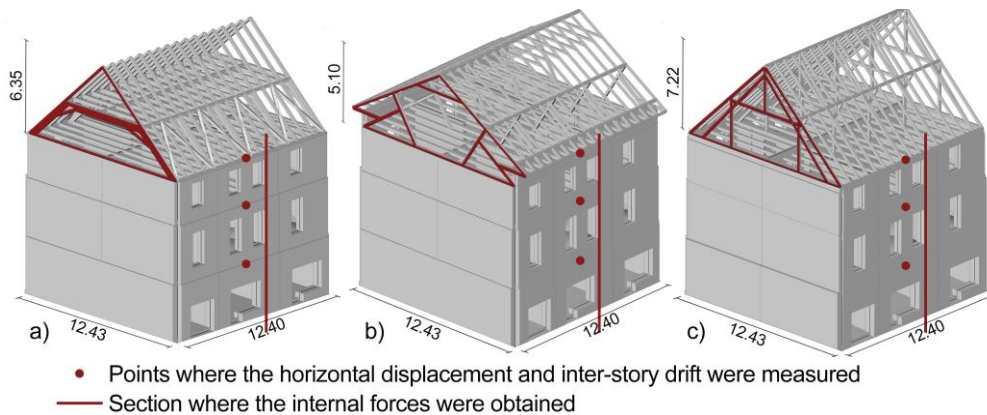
The finite element models - a) first; b) second; c) third roof structure [167]
